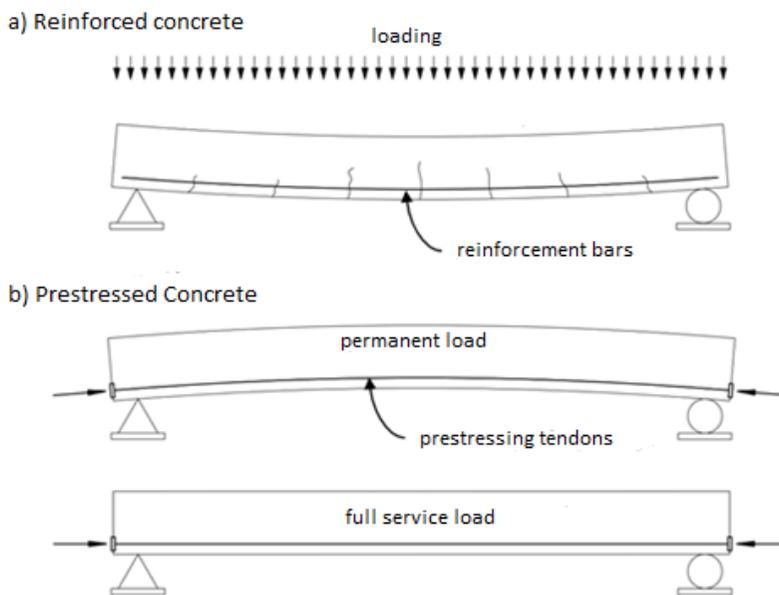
Difference in Behaviour of Reinforced Concrete and Prestressed Concrete under Applied Load [11]
